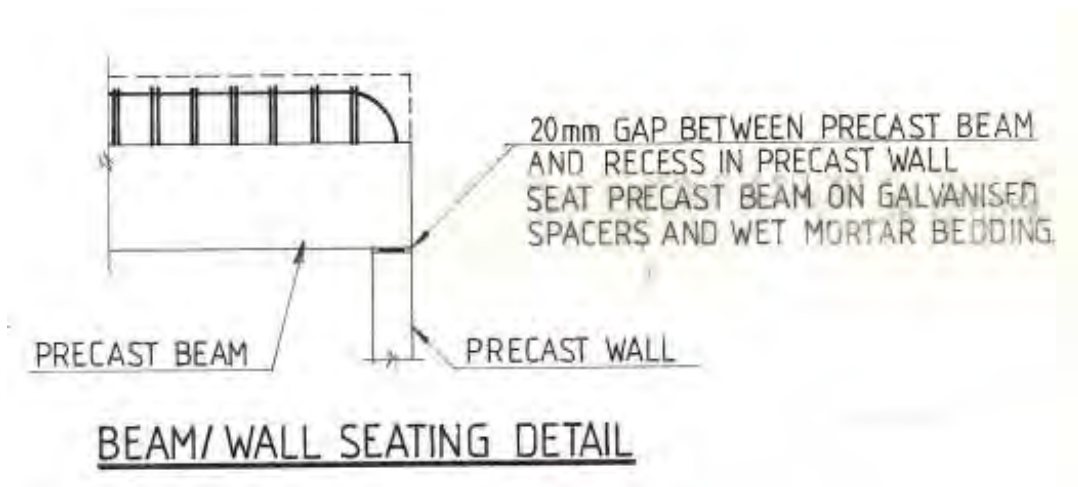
Extract from as-built drawing S2 - showing beam-wall seating detail
